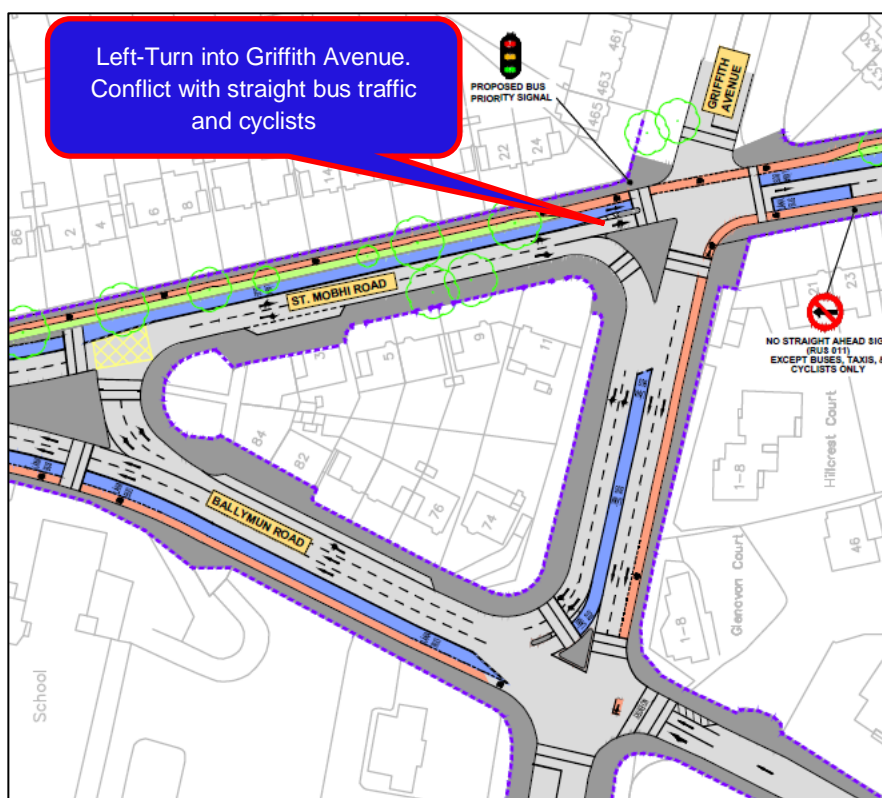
Option A: EPR Road Layout at St. Mobhi Road / Griffith Avenue Junction
